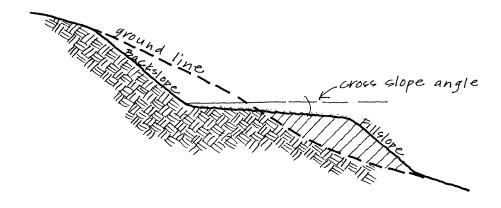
TYPICAL TRAIL PROFILE
